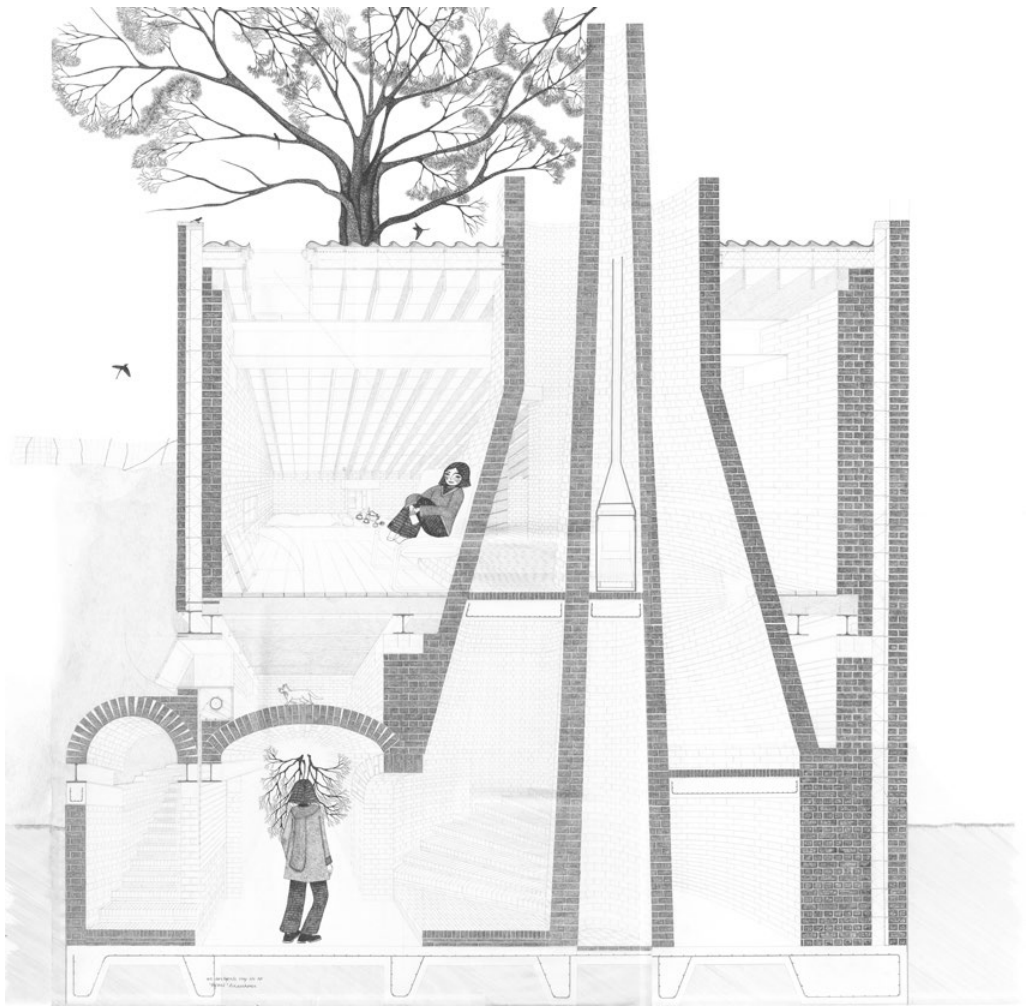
(Drawing) Porrez, M. (2021) Perspective Section: *Constructed place of withdrawal
